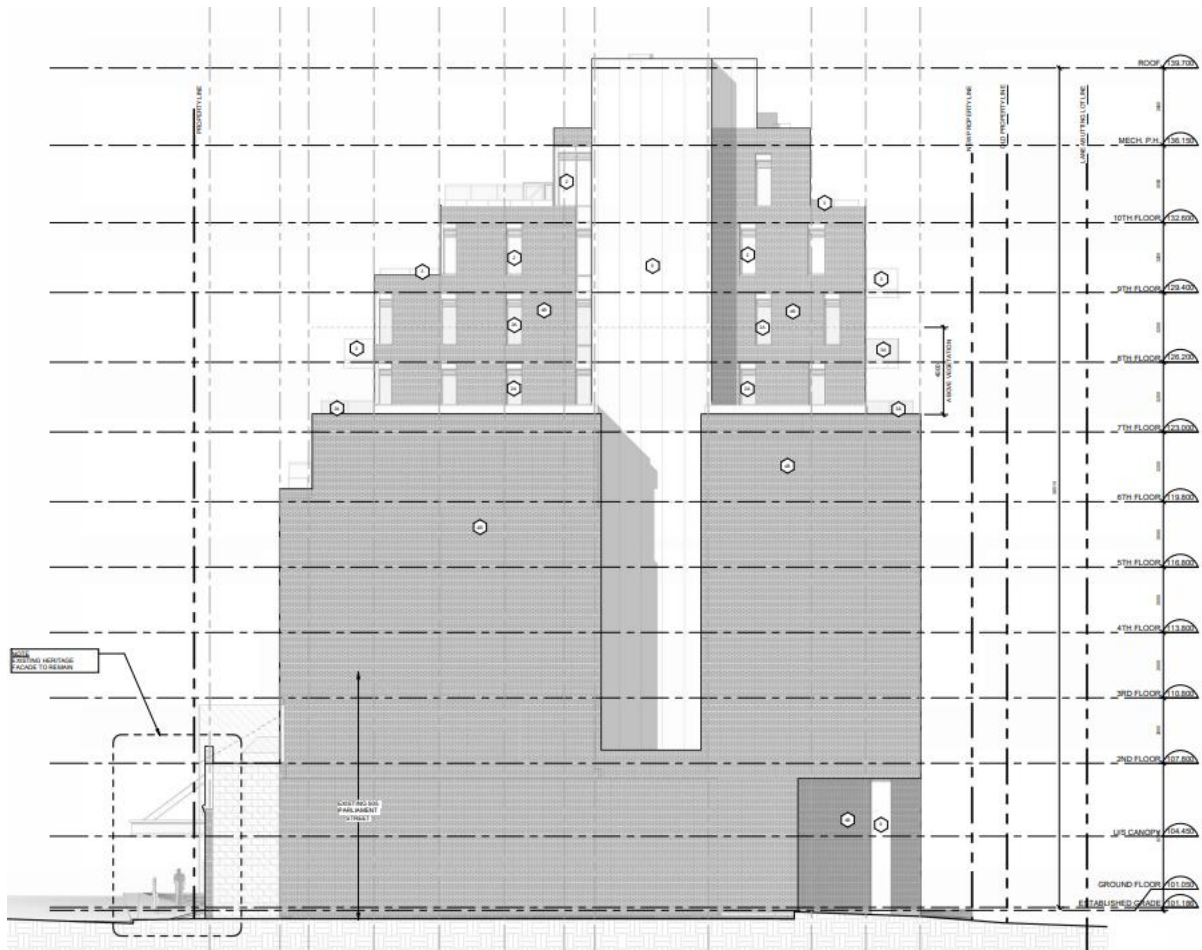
Proposed south elevation of 509 Parliament Street (RAW Architects Inc., 2025).
